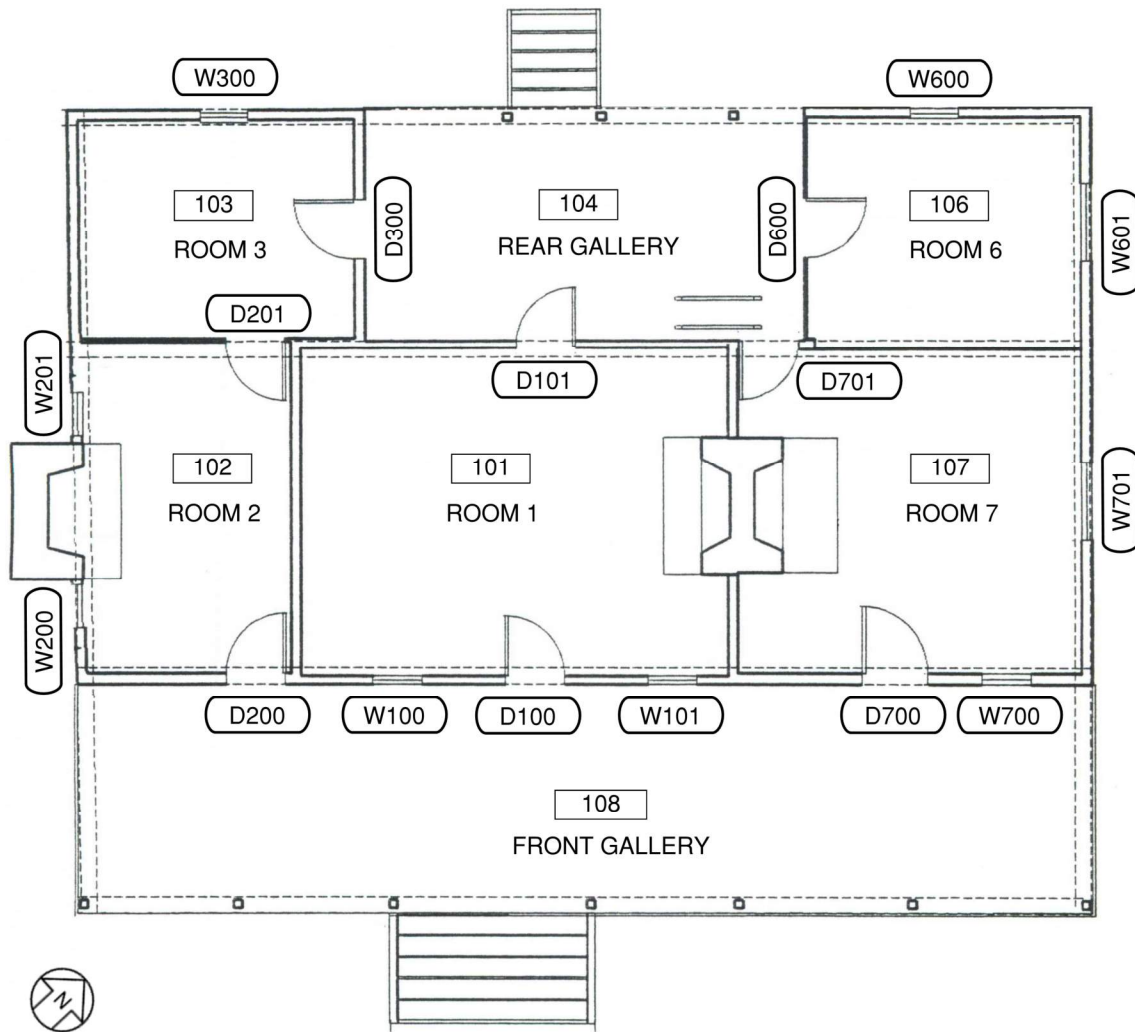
Floor plan of main level, showing room, window, and door designations as used in this report.
